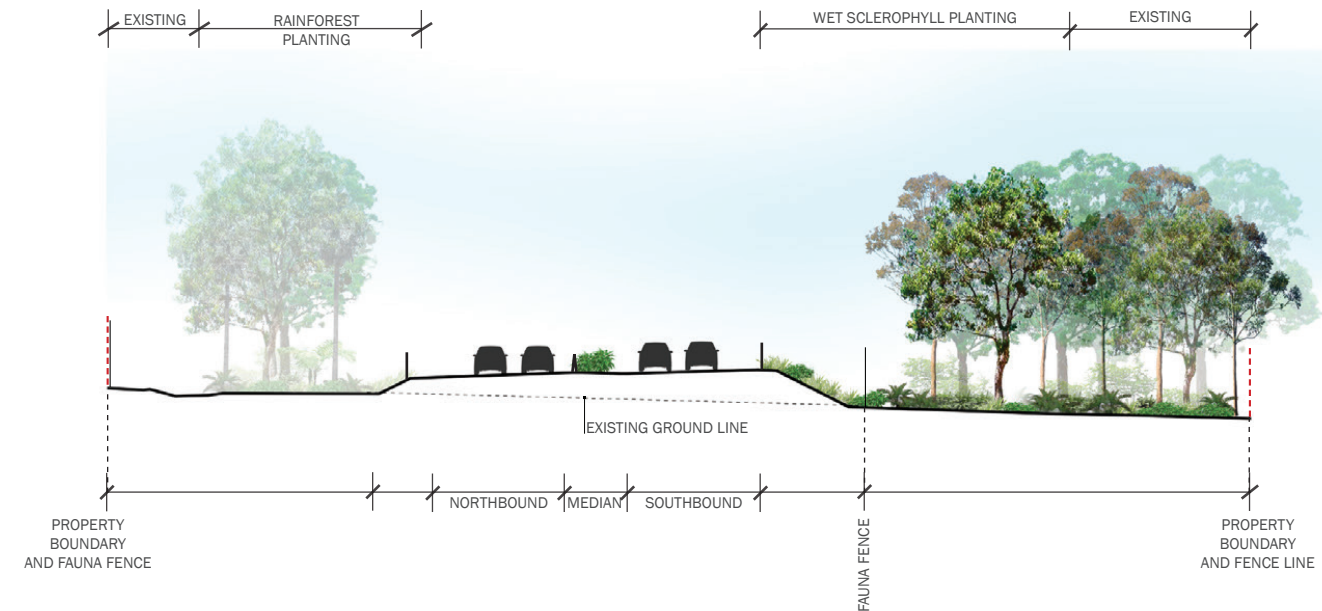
Cross section F-F in Wardell (Scale 1:400)
